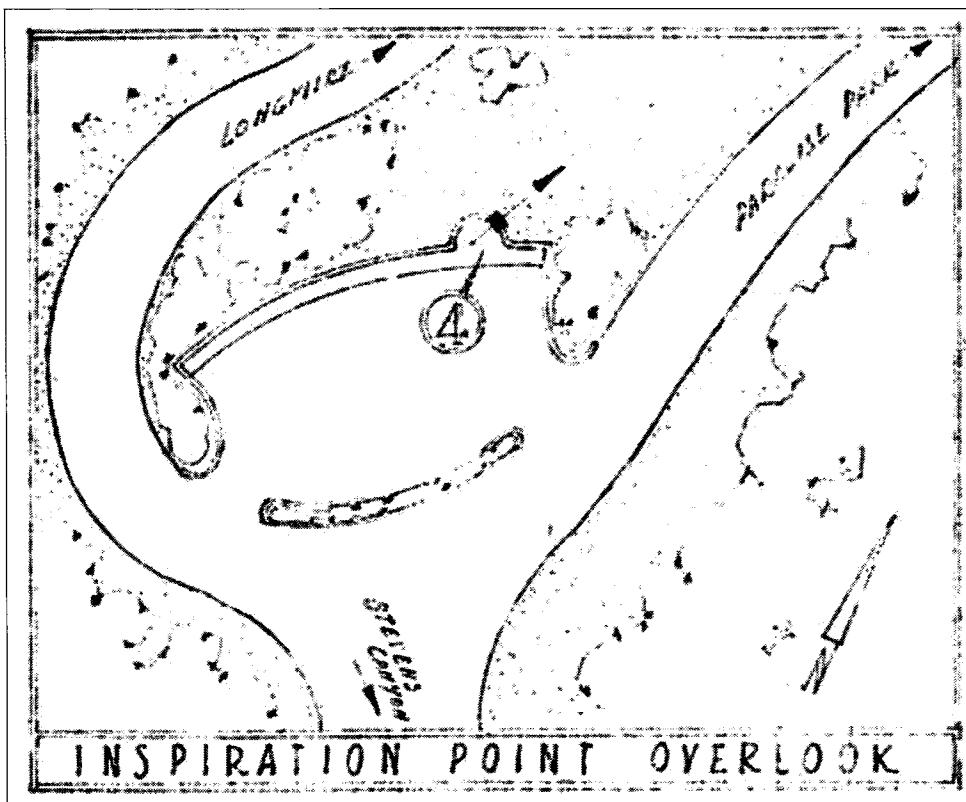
Historic plan showing proposal for Inspiration Point with Paradise Park road (Valley Road) providing access to Paradise and the turnout located on the cut side of Stevens Canyon road, 1955 (MORA Archive).
